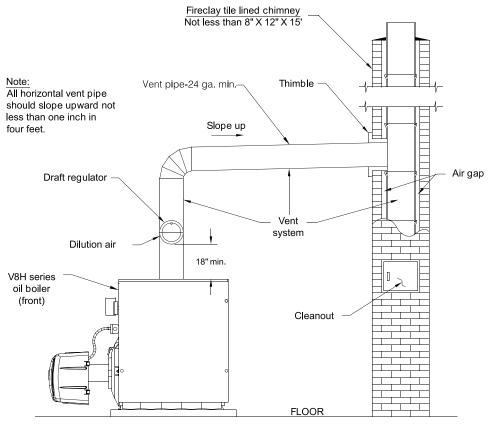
Recommended Vent Pipe Arrangement and Chimney Requirements
